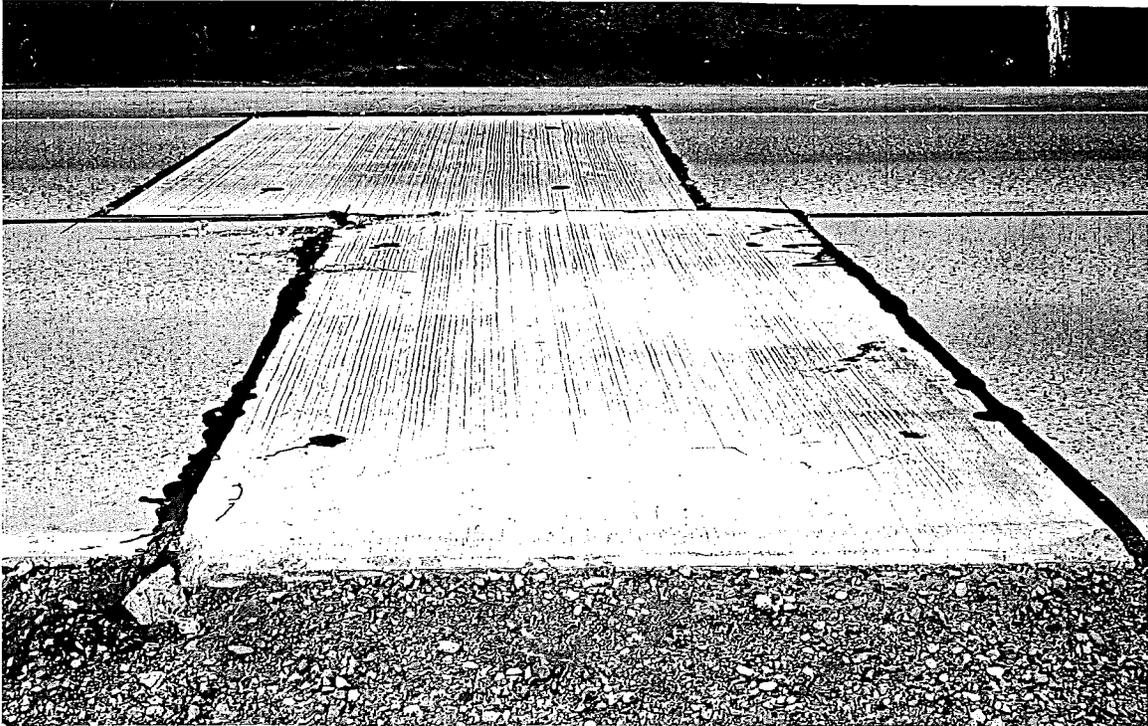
Condition of repair at Sta. 1369+90 (southbound). High side of slab and spalling are on the left side of repair.
